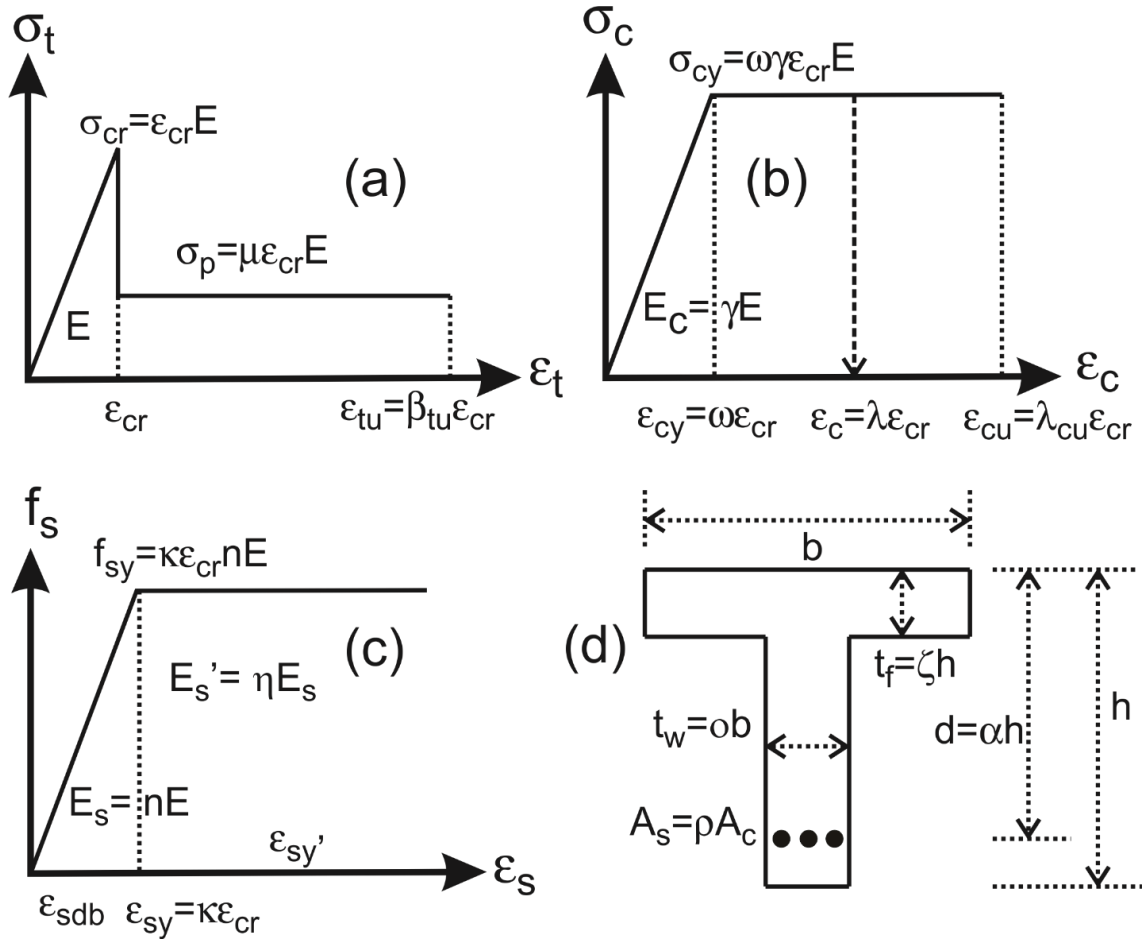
Material Model for Single Reinforced Concrete Design (a) Tension Model; (b) Compression Model; (c) Steel Model; (d) Beam Cross Section.
